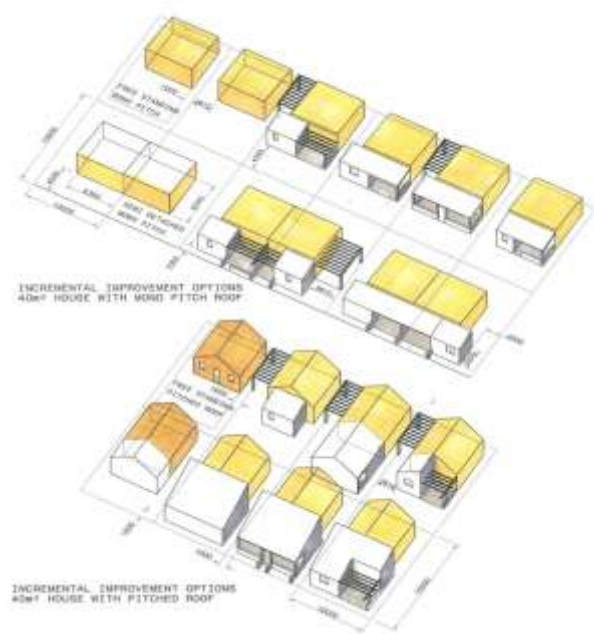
Examples of typical additions to pitched roof prototype 40 m² houses
